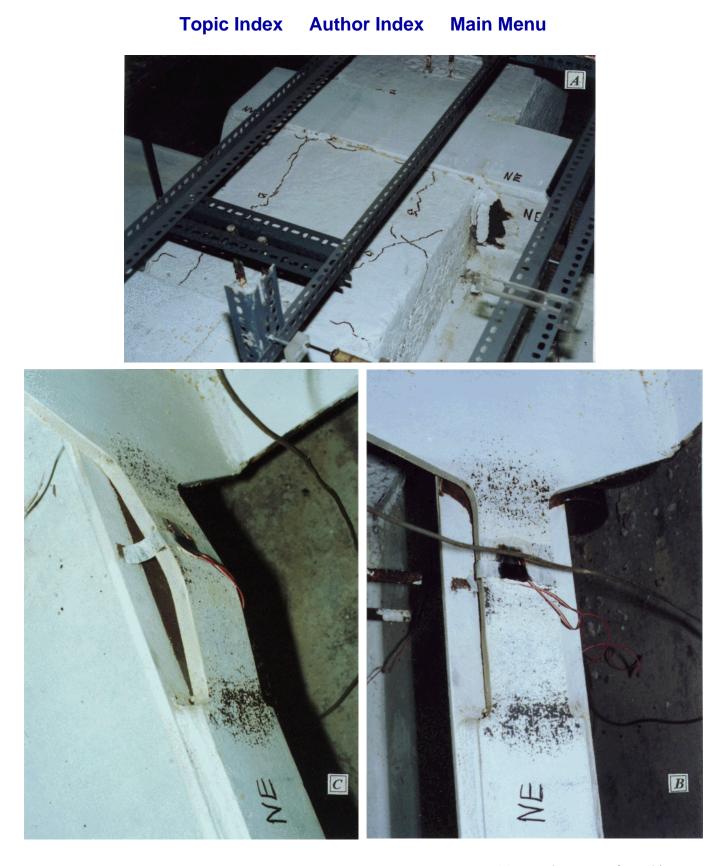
Testing of specimen retrofitted with ductile steel fuse-plates: (a) Development of cracking contained by steel bands; (b) Energy dissipation by tensile yielding of fuses; (c) Energy dissipation by ductile buckling of fuses.
